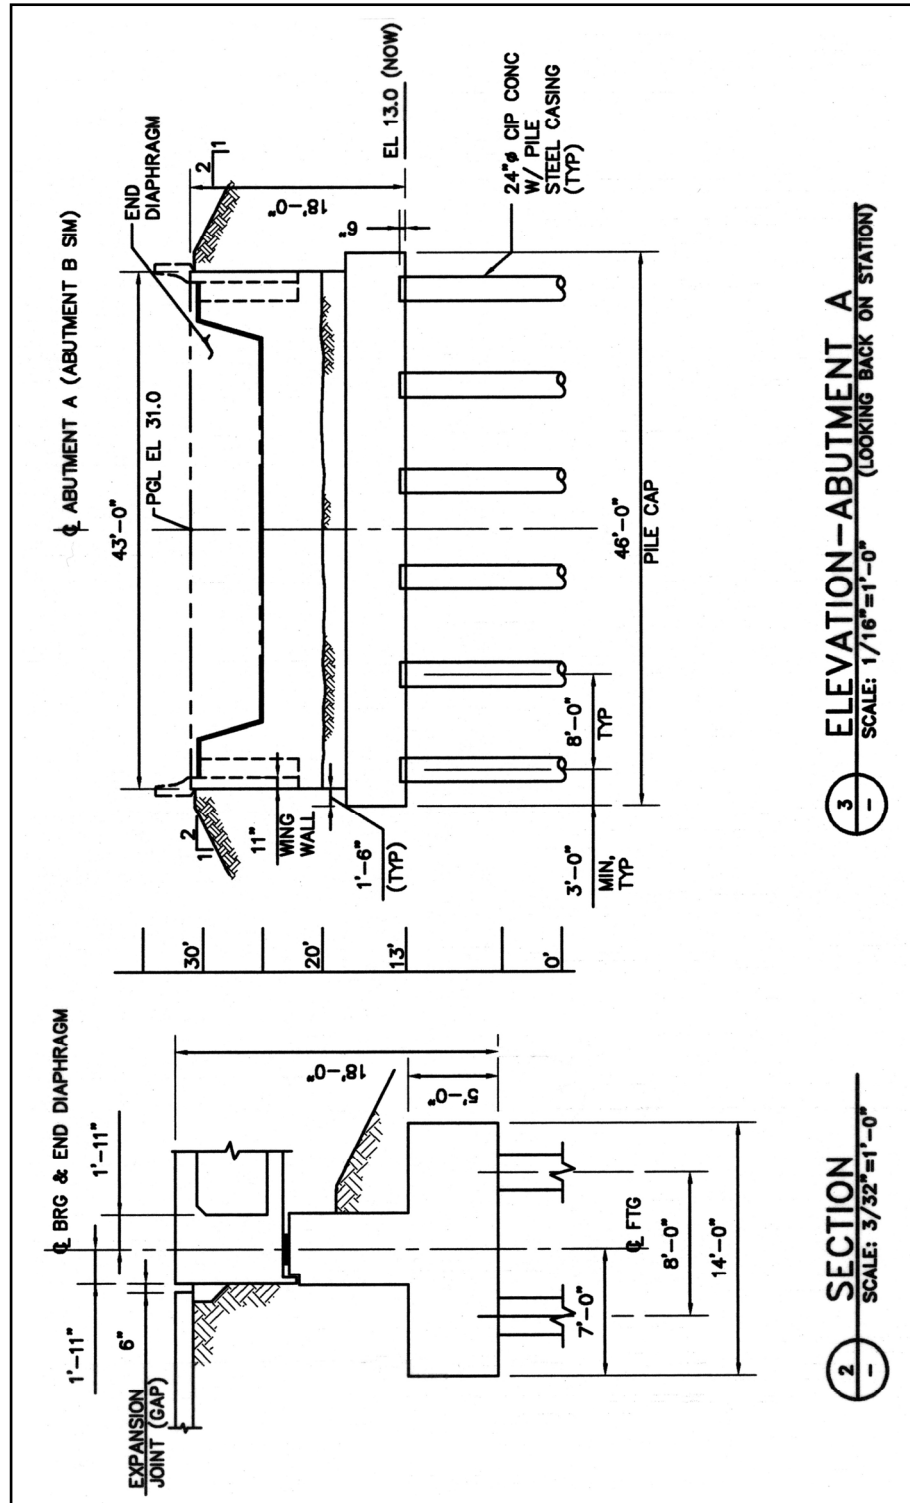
Bridge No. 8 - Stub-Type Abutment
